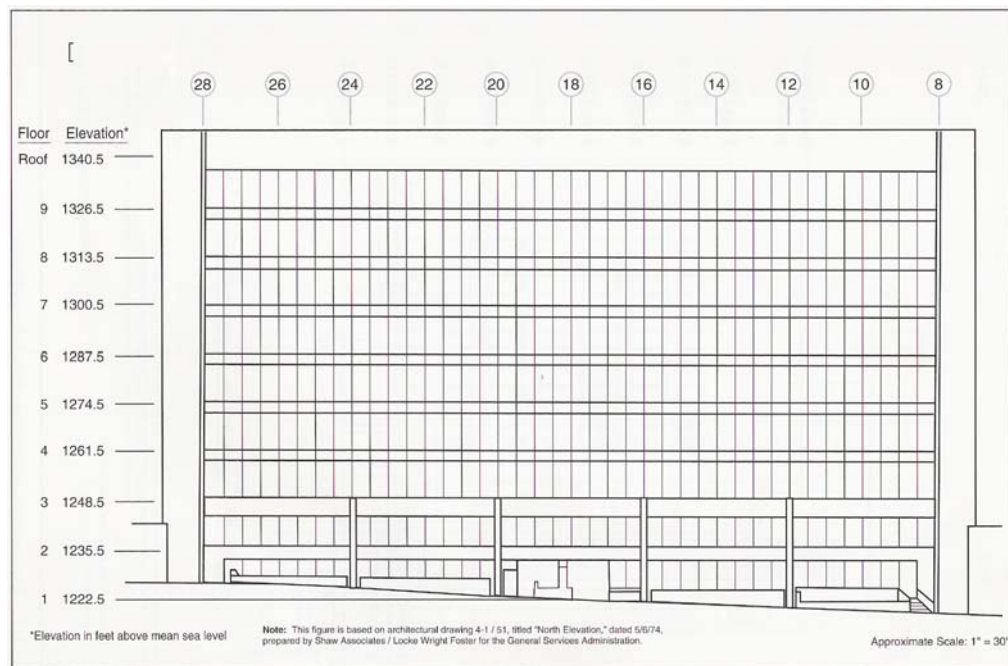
North Elevation Of Murrah Building (FEMA 1996)
